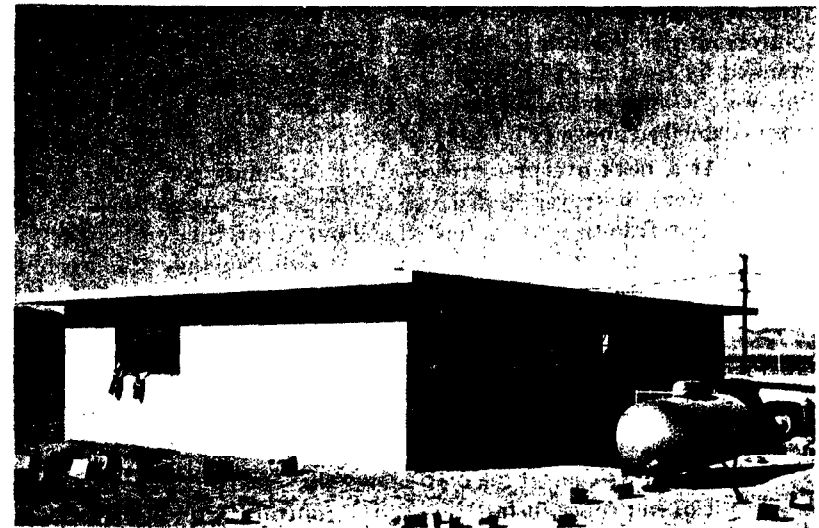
Reinforced precast concrete house after the nuclear explosion (5 psi overpressure). The LP-gas tank, sheltered by the house, is essentially undamaged.
